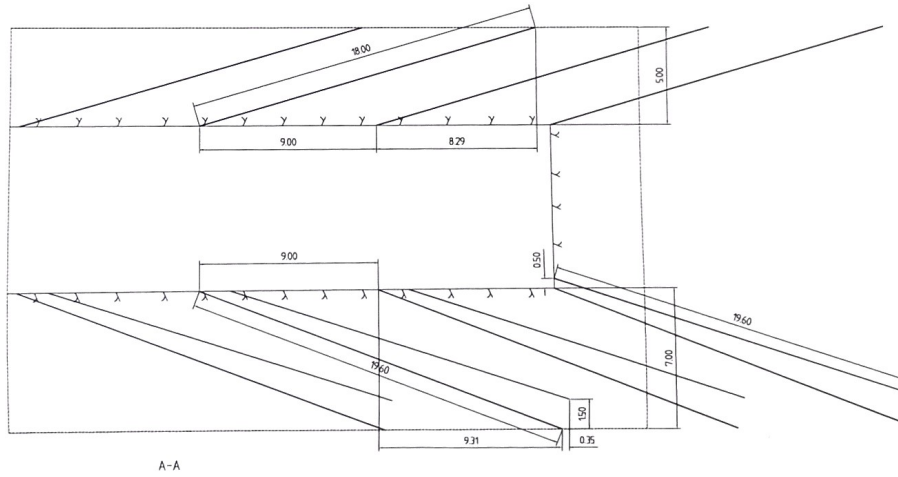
A profile of the grouting design used for the main tunnel tubes for the Göta tunnel (Technical drawing 200B2442).
